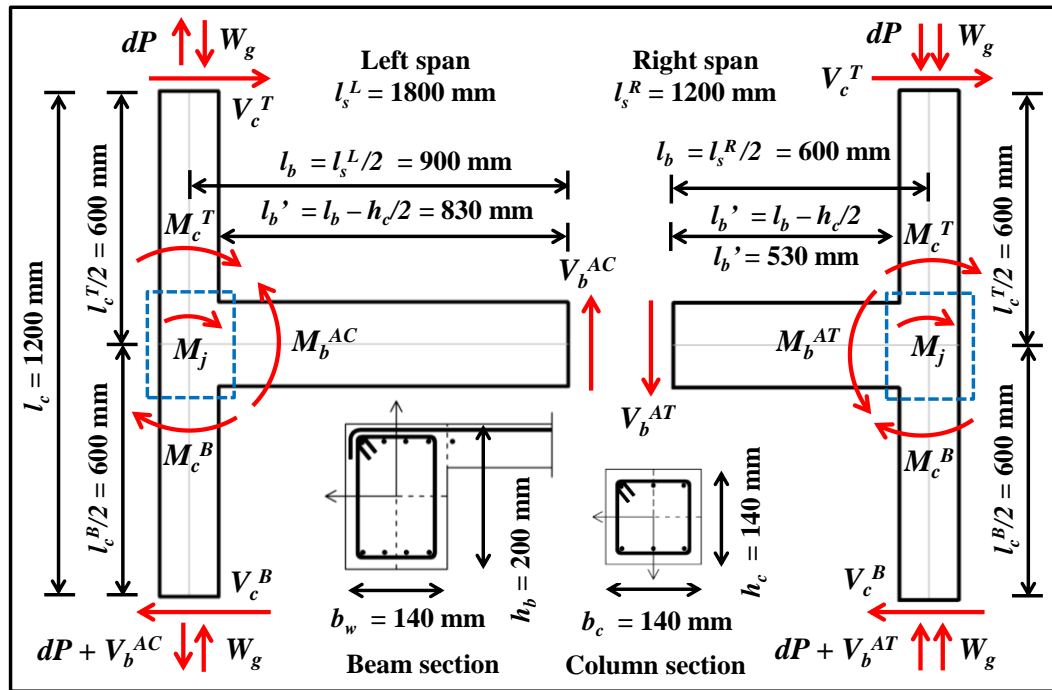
Exterior beam column joints equilibrium – left and right hand side spans.
